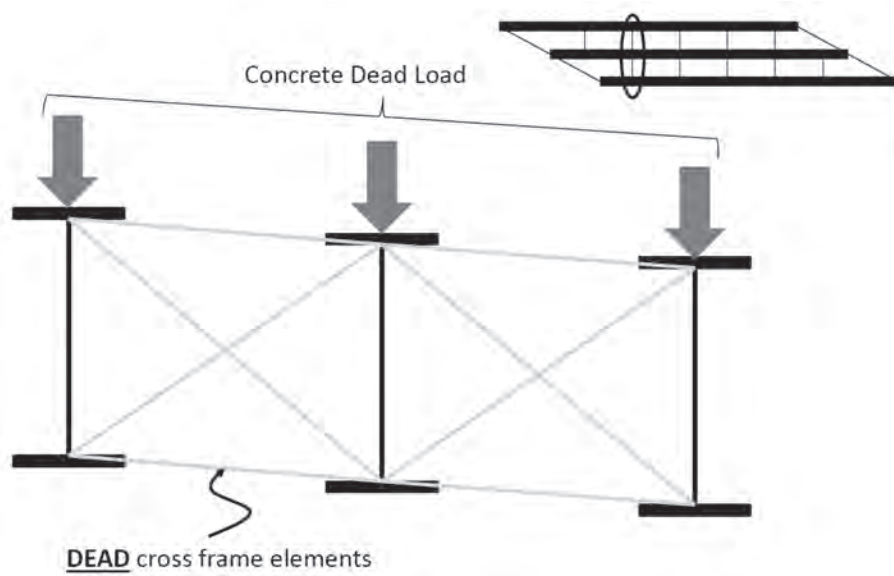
Application of concrete dead load on girders after killing cross-frame elements.
